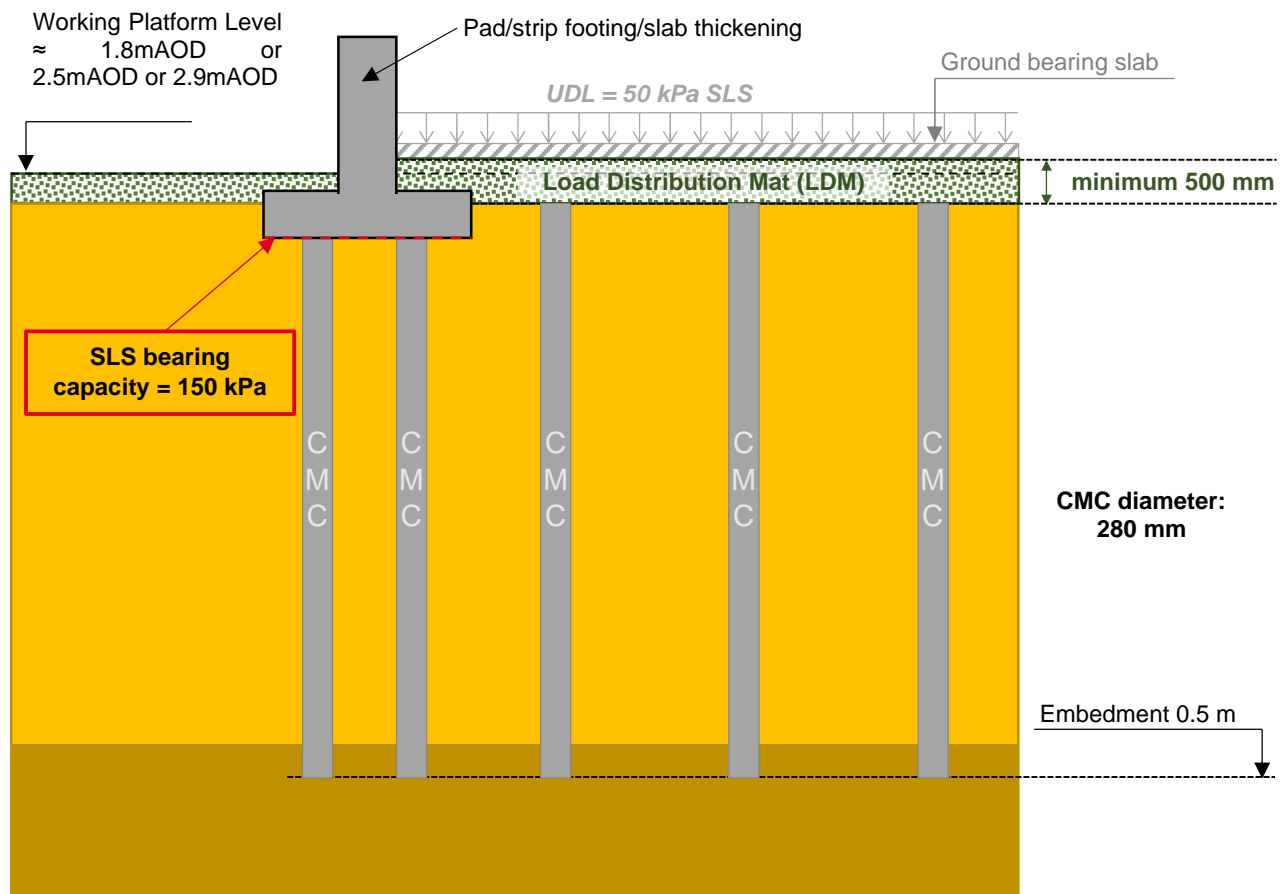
Typical cross section of footing and ground bearing slab on CMC
